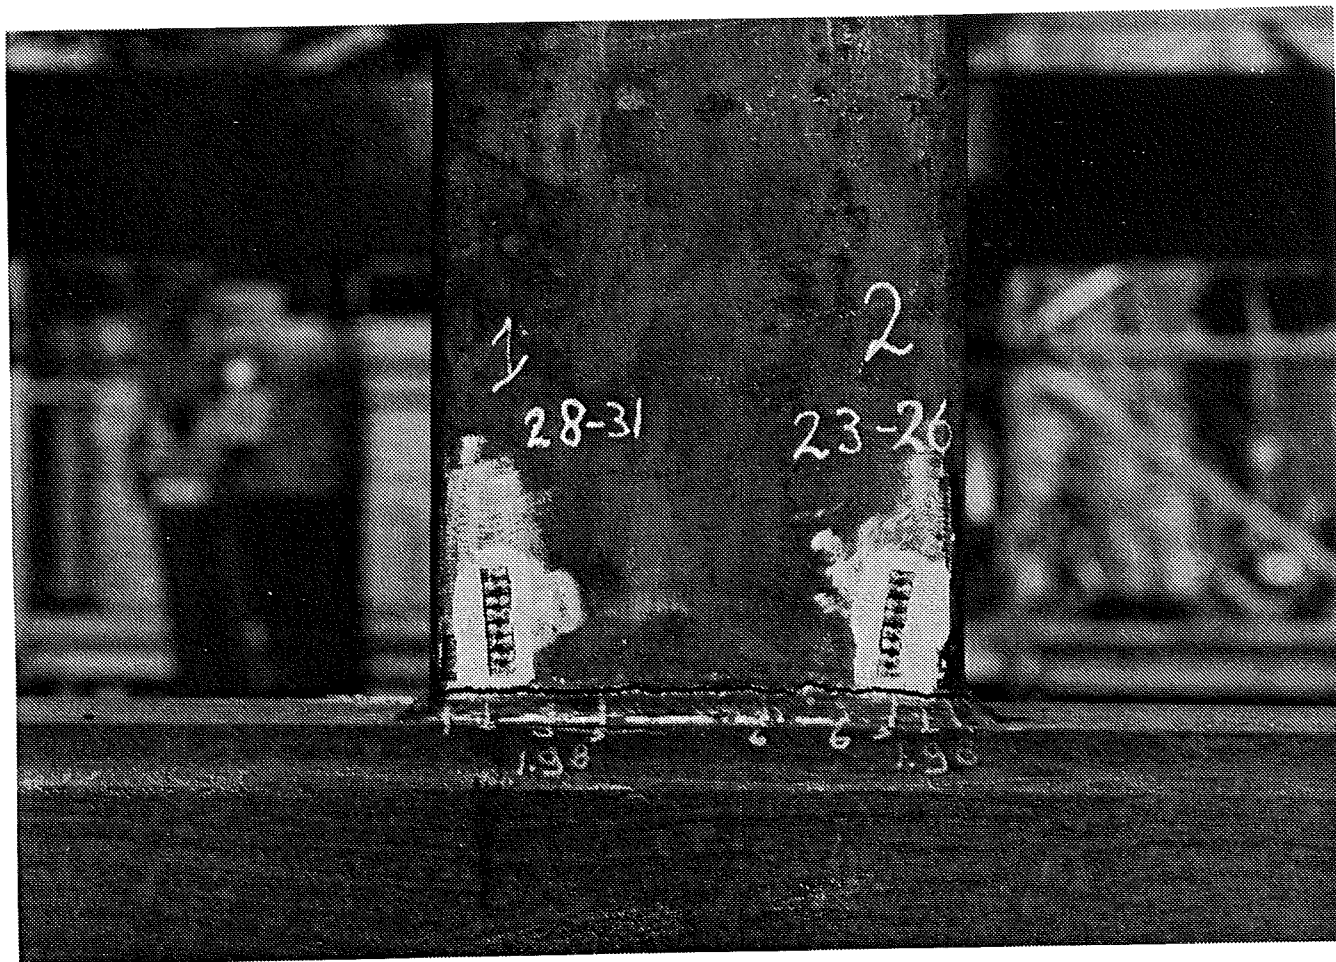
Typical crack shape of a T-joint specimen (brace thickness 5 mm)
